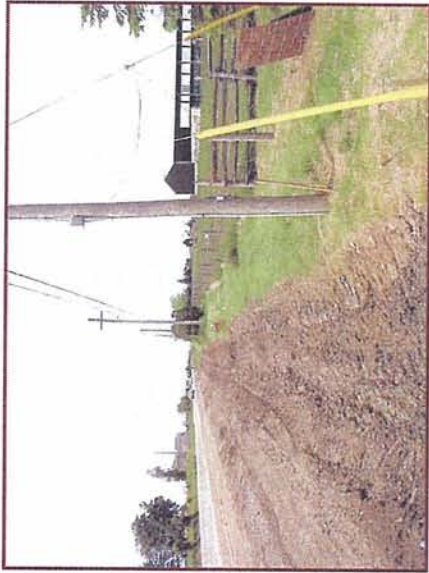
Newly Graded Ditch North of Mayfield Road, East Side of Dixie Road (looking northeast)
